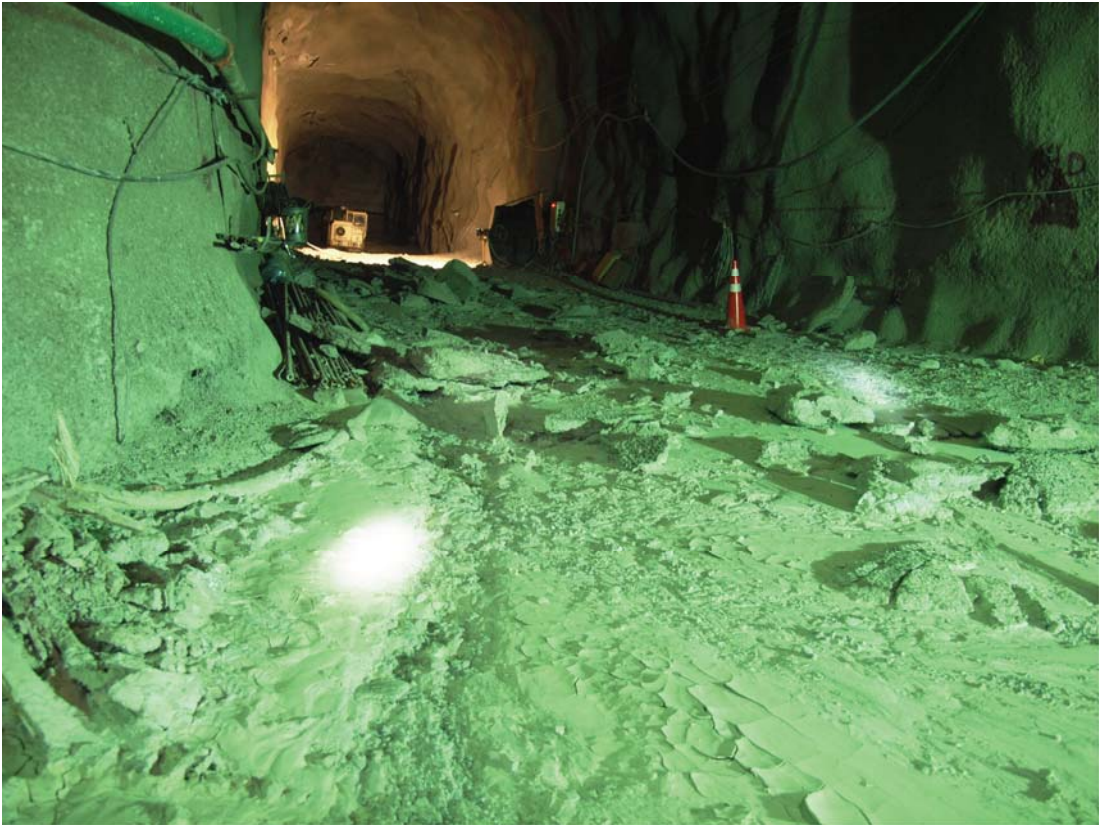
Ejected shotcrete materials on the floor at underground mine.
